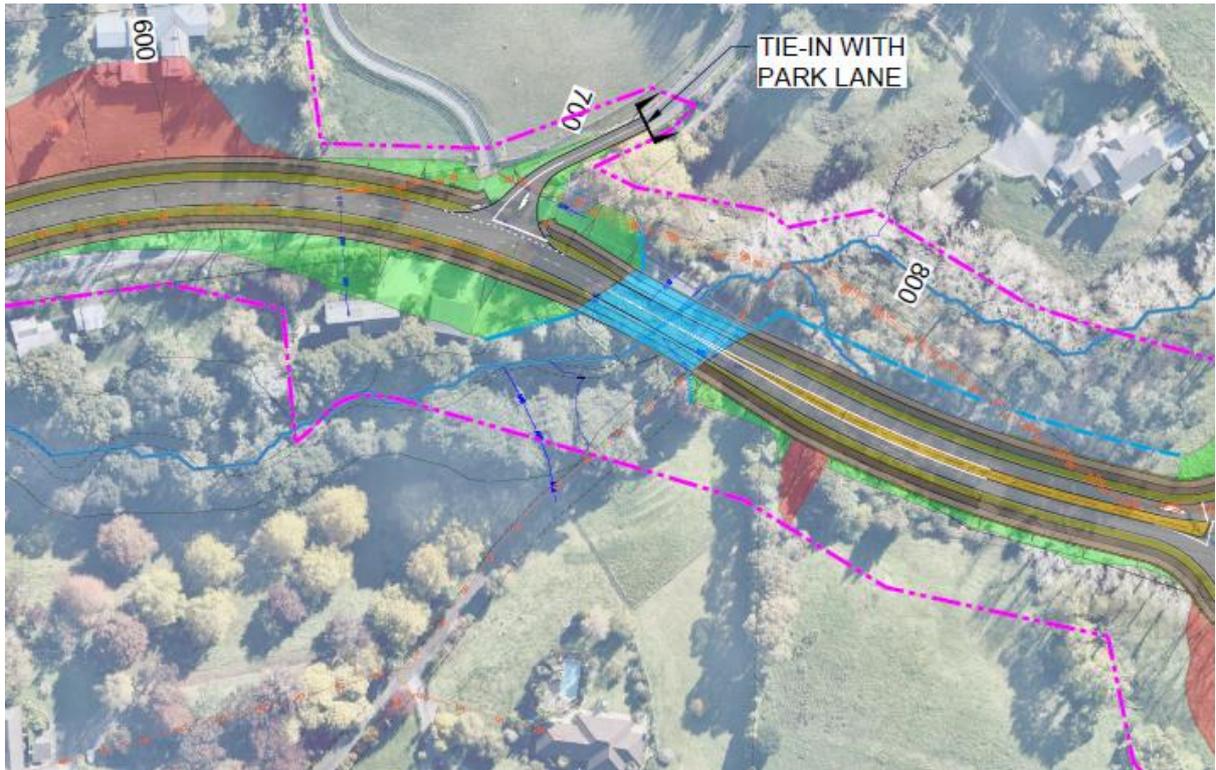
The southern side of Sandspit Road has space for extensive planting.
